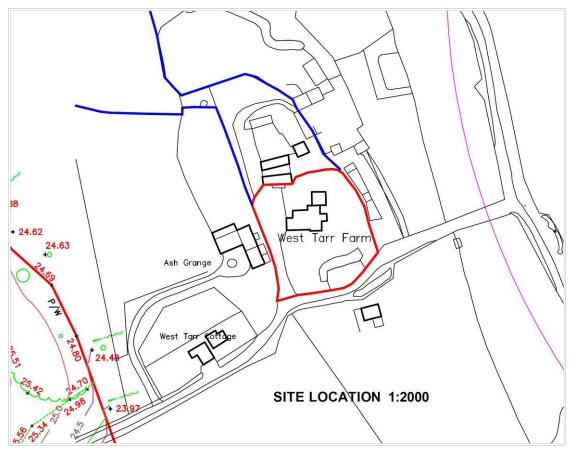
Site location plan showing the proposed development area (outlined in red). Plan supplied by client.
